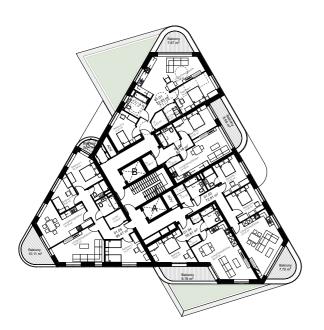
1st floor plan (not to scale). Source: Stockwool.
